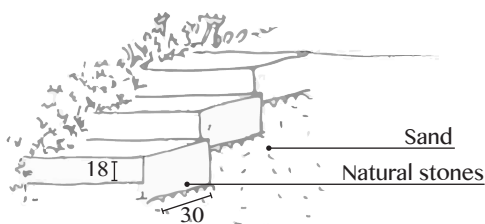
Detail E Typical stairs between terraces, dimensions in cm
